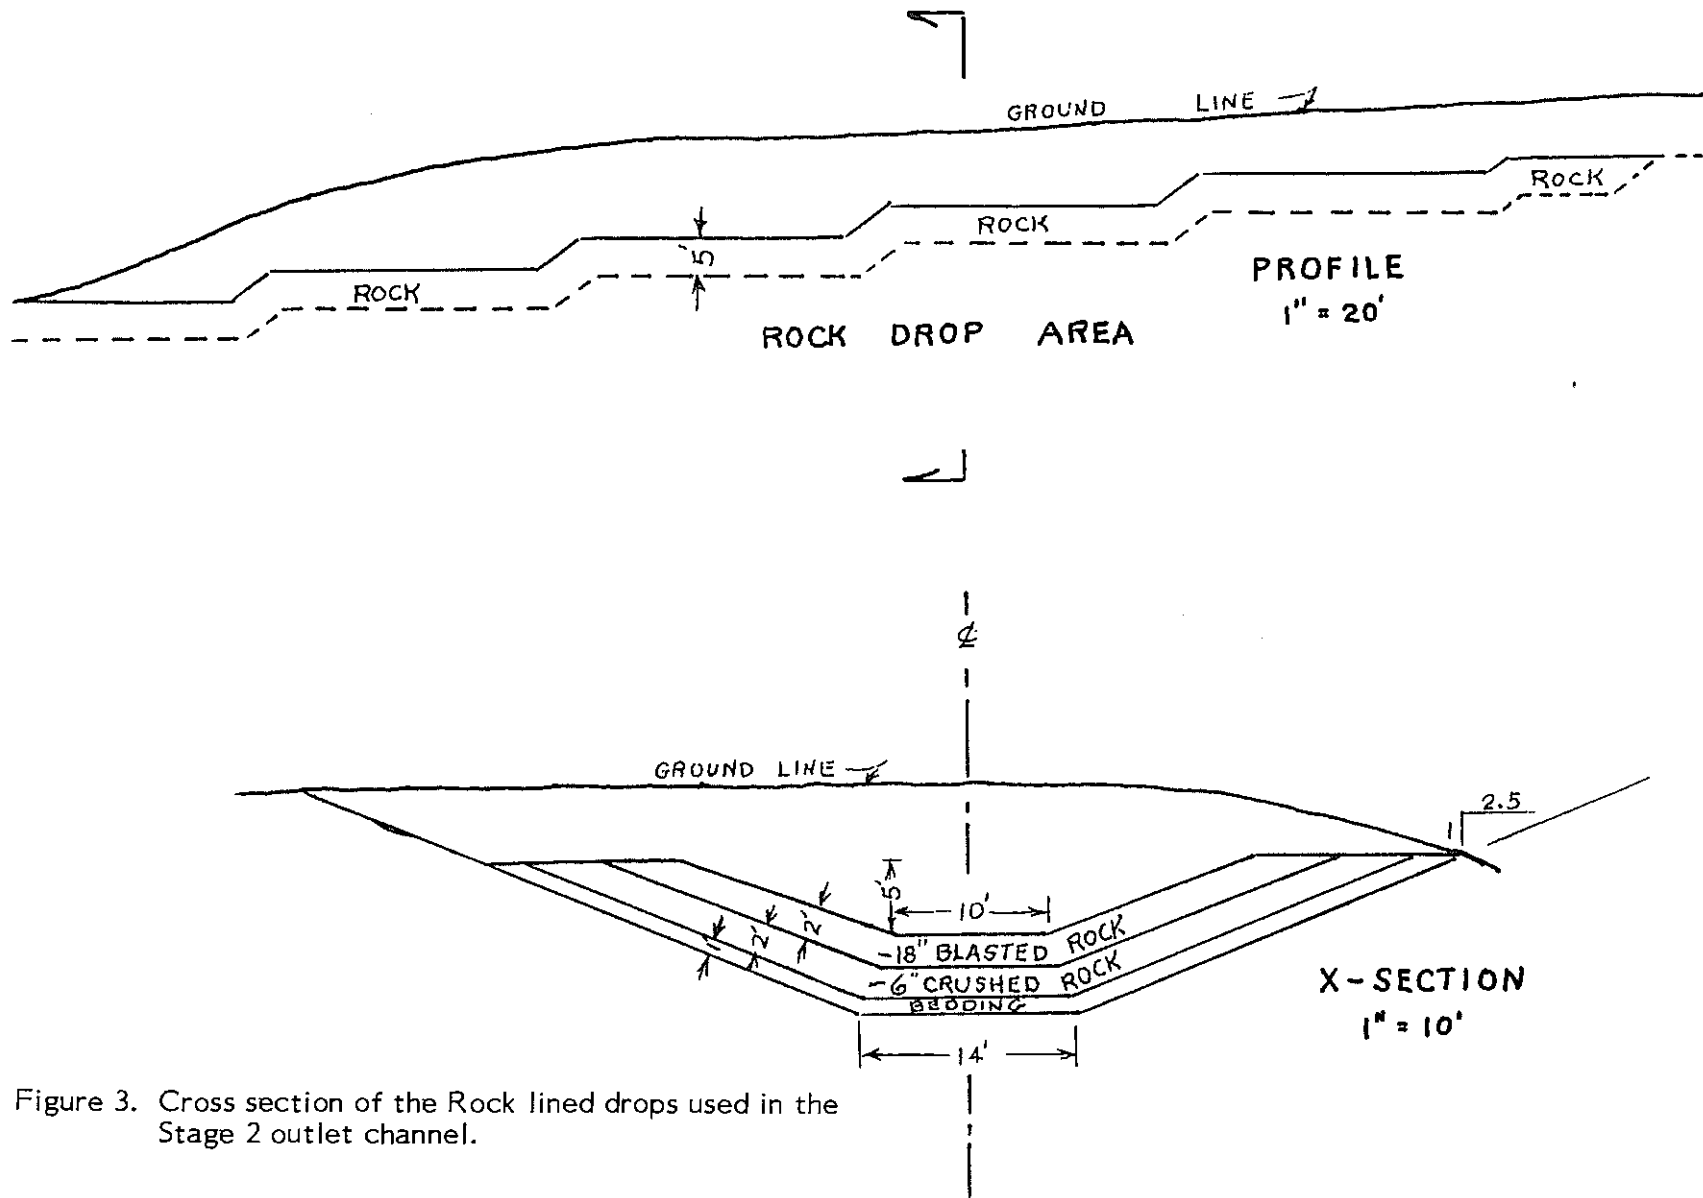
Cross section of the Rock lined drops used in the Stage 2 outlet channel.
